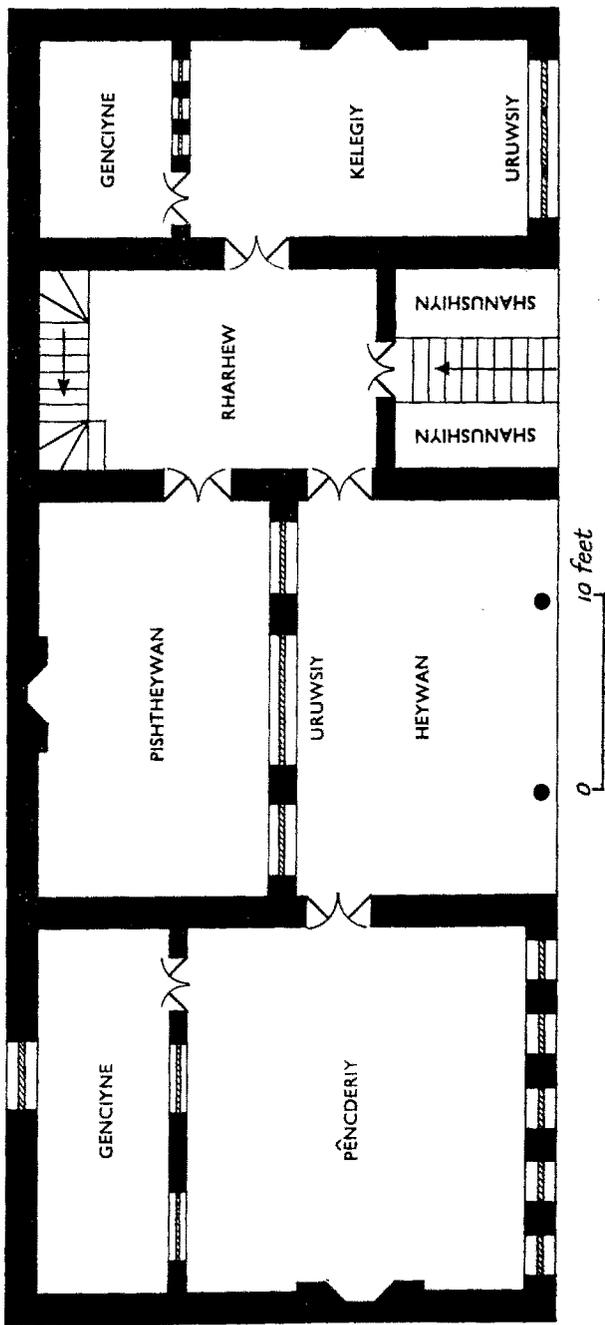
Plan of Kurdish Town House: First Floor. Scale about 1:100'.
